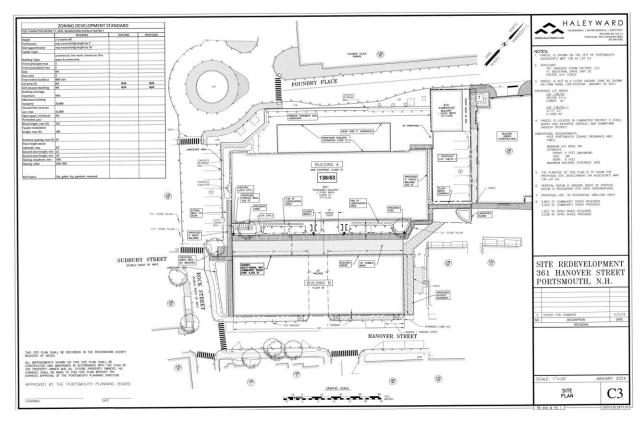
Alternative Plan showing Community Space (Shared Multi-Modal Way)
